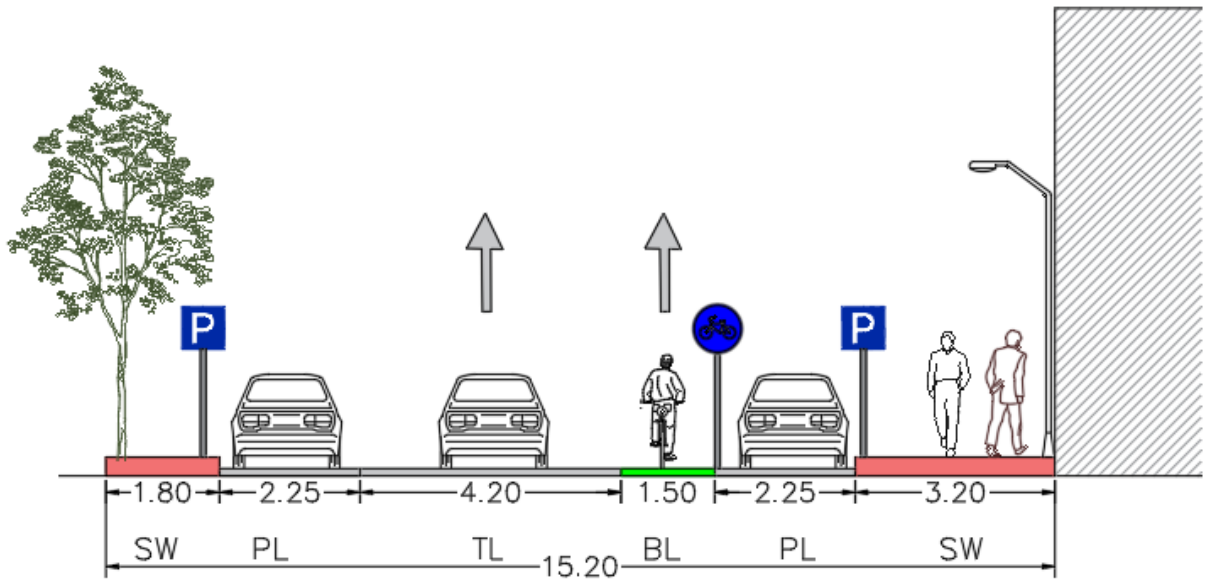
15: Typical Cross Section, section E-E Al-Shwetreh Street
